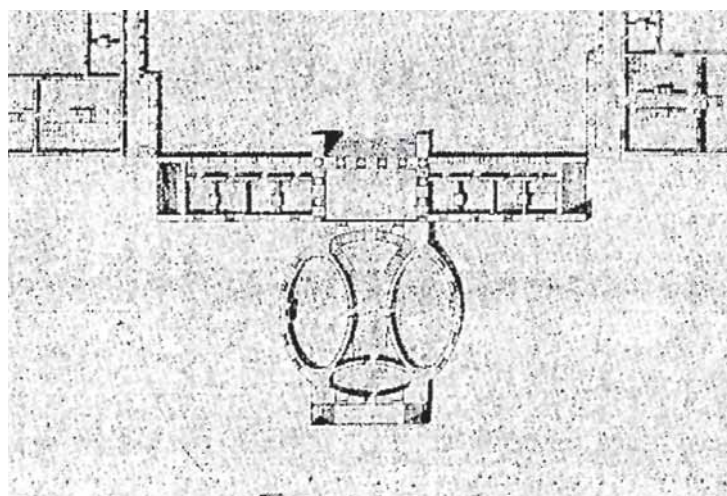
John Neilson, ground level plan of the Lawn, circa March 1821 (detail of Rotunda, below). Note north porch and steps of Rotunda. [Virginia State Library and Archives]
